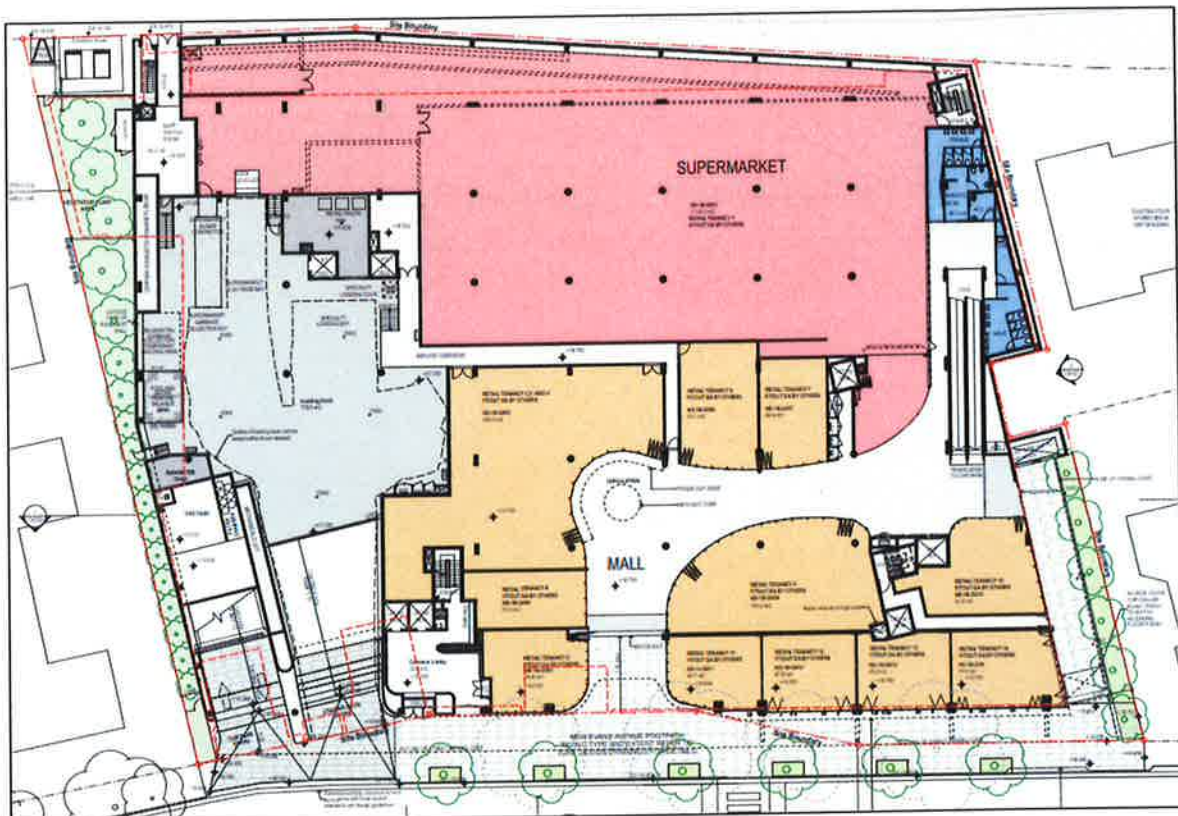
Proposed ground floor retail layout (source: Proponent's RTS)
